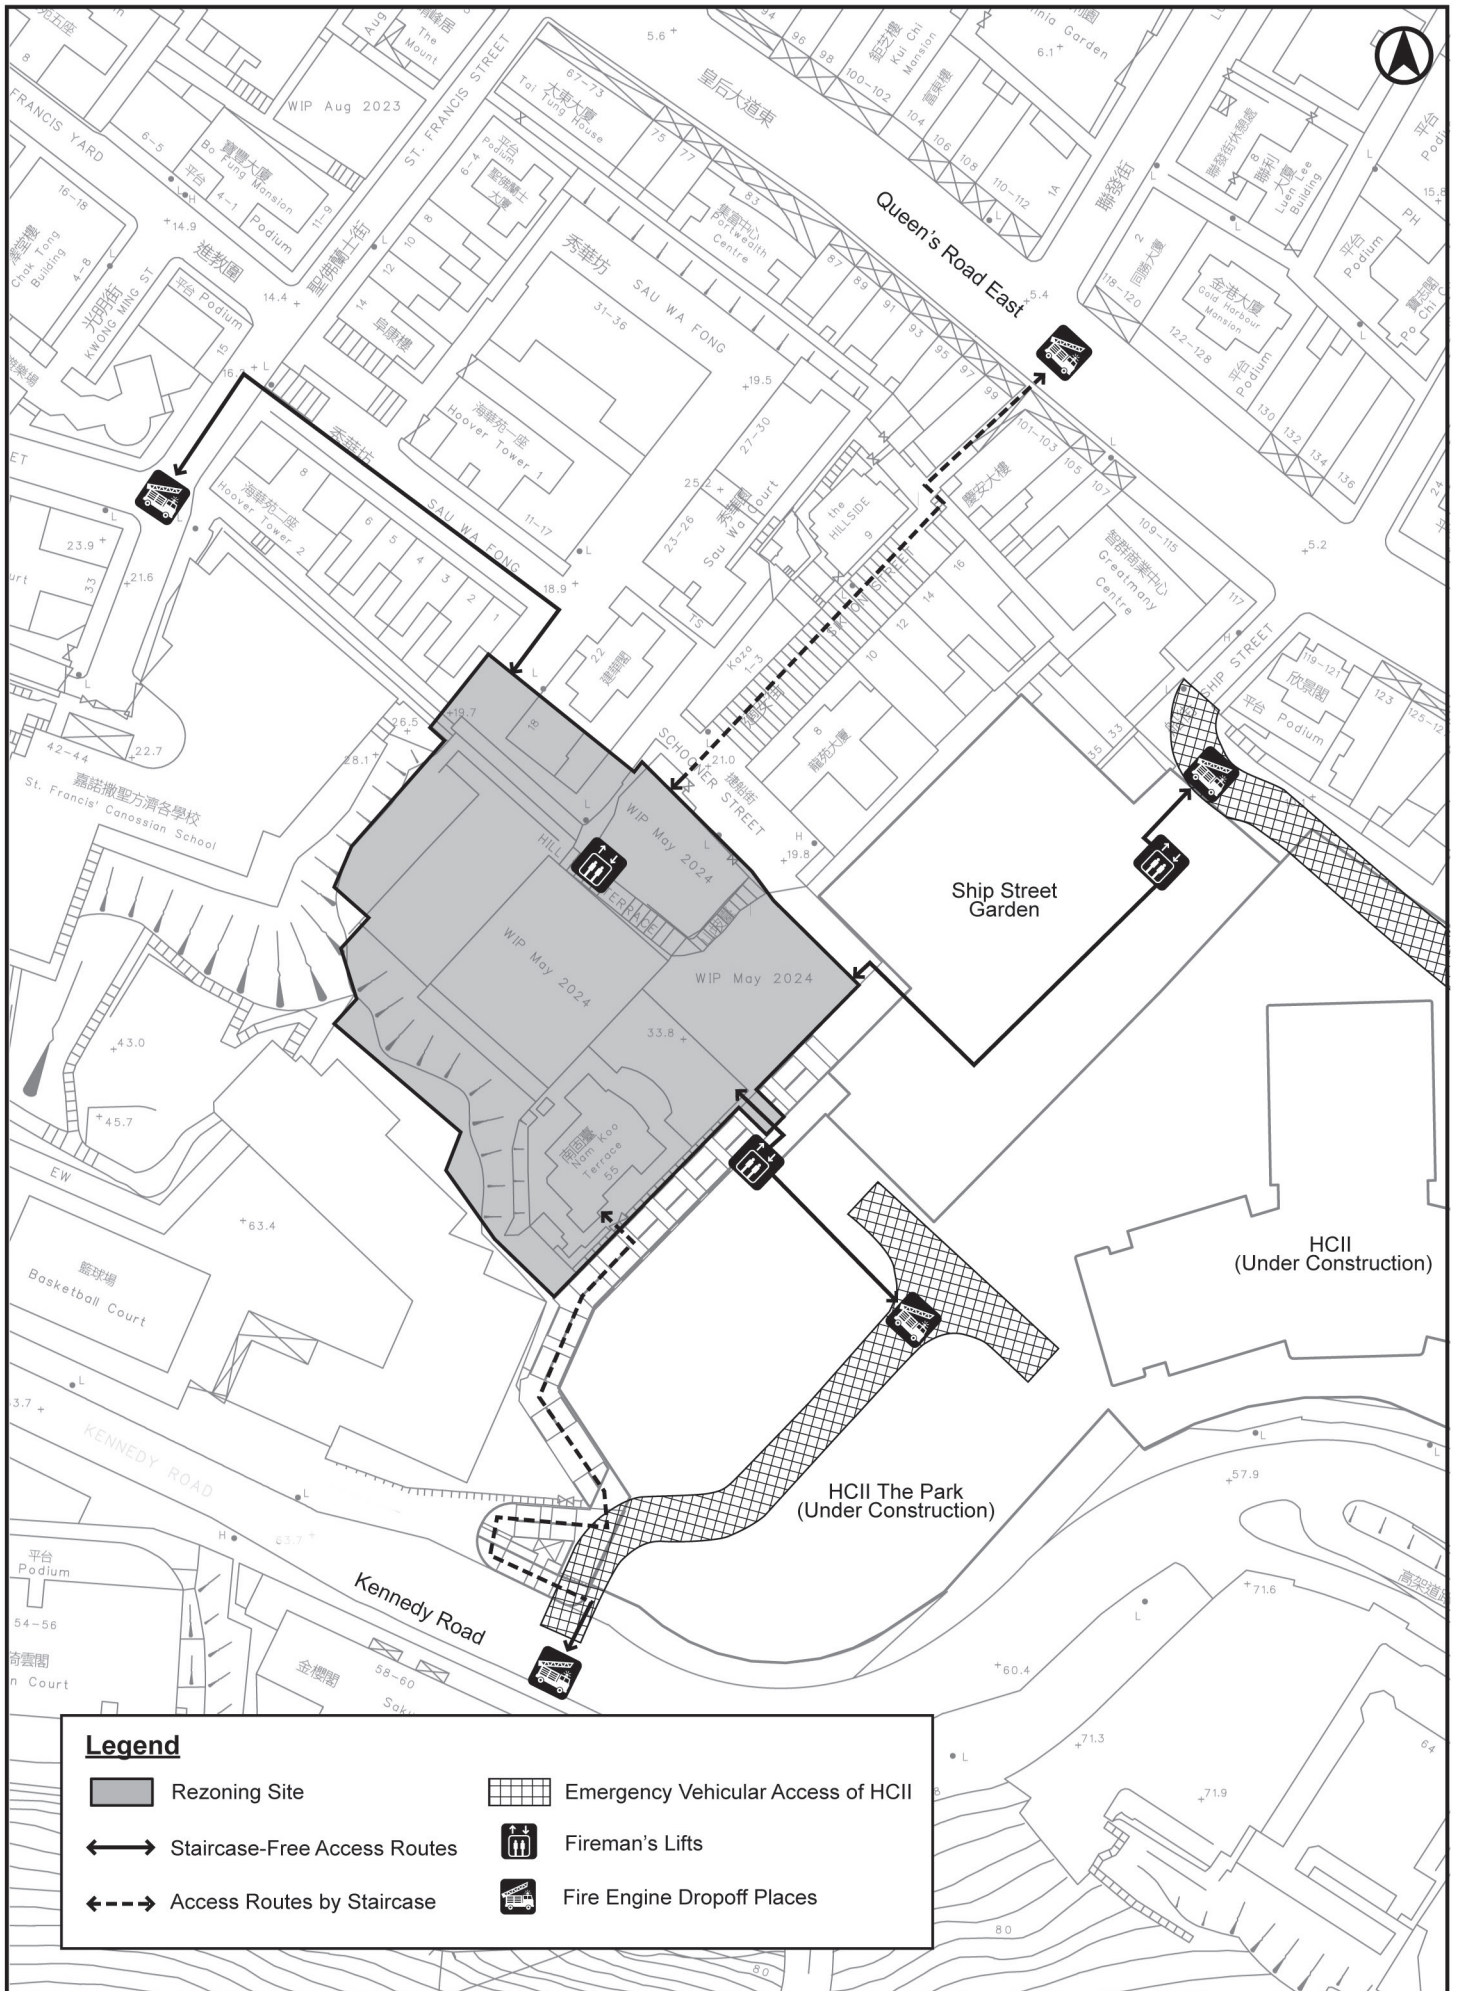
FIREMEN'S ACCESS TO / FROM THE SITE
